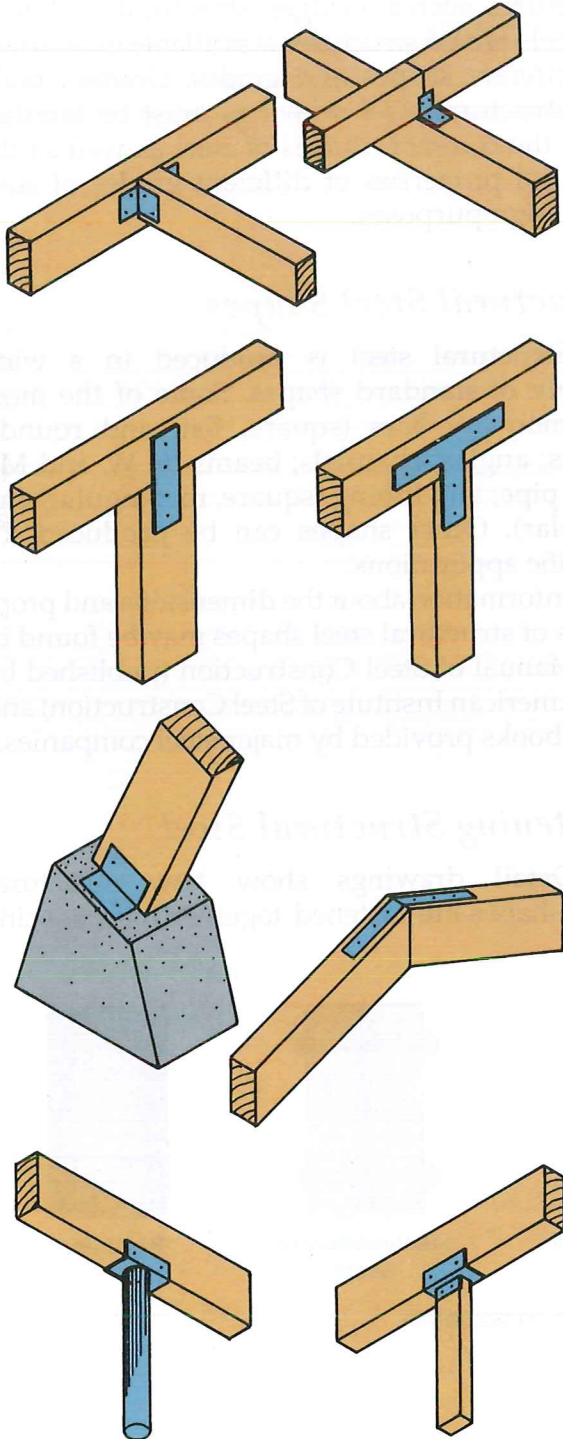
Metal fasteners are typically used to connect large wood beam sections. Shown are common ways to fasten sections together.
